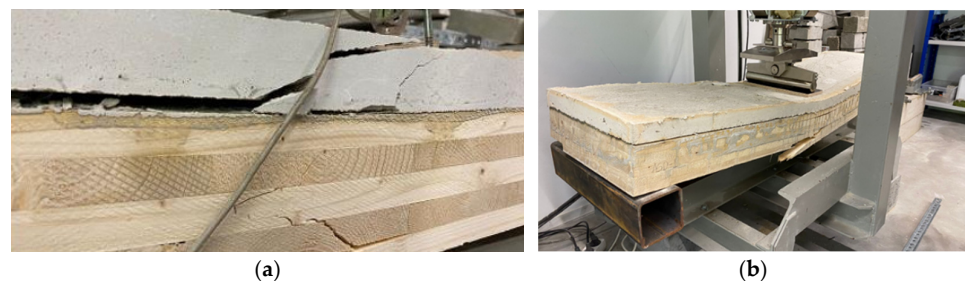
Failure modes of the TCC specimens without (a) and with (b) the fibres added to the concrete layer in the case of adhesive timber-to-concrete connection.
